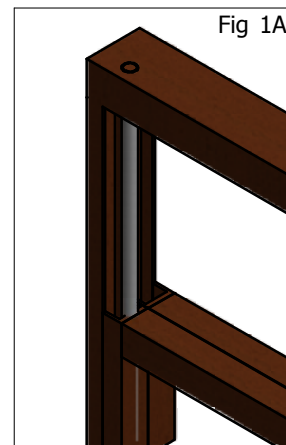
A: If window is already installed. Fully lower the sash before attempting to insert the balance into the machined groove in the sash or frame.
